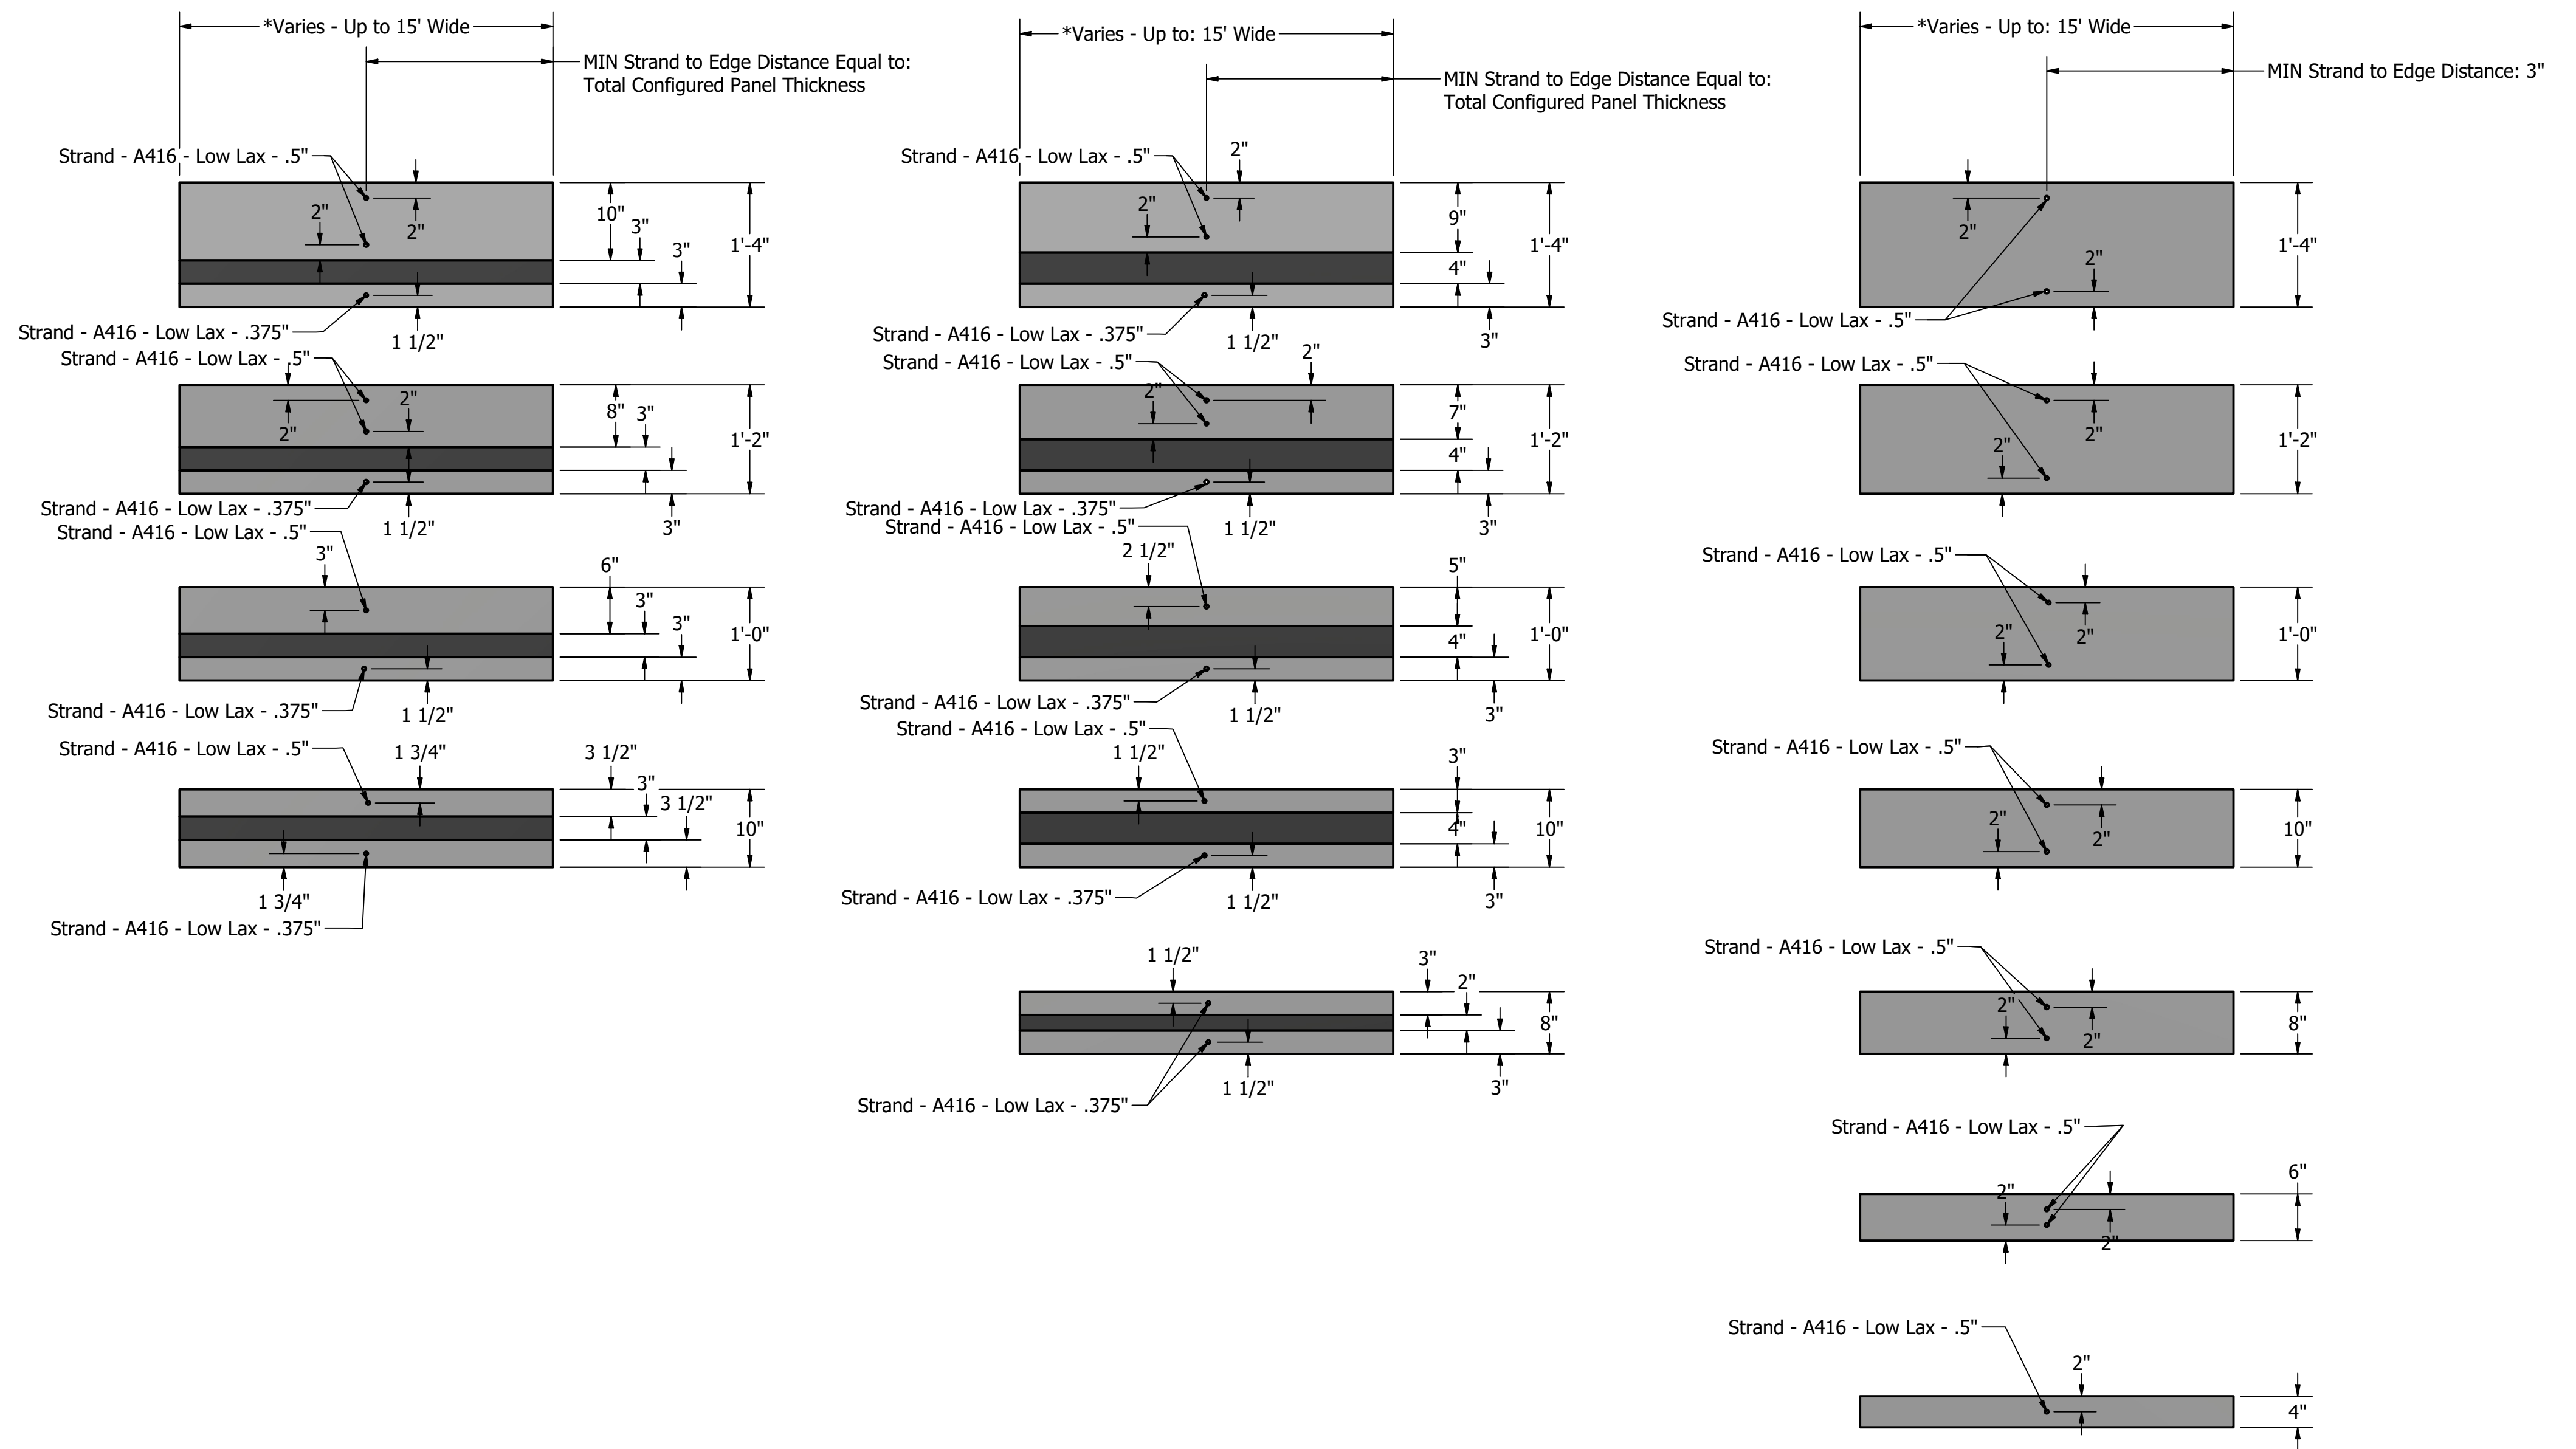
Solid or Insulated Flat Structural Wall Panels
